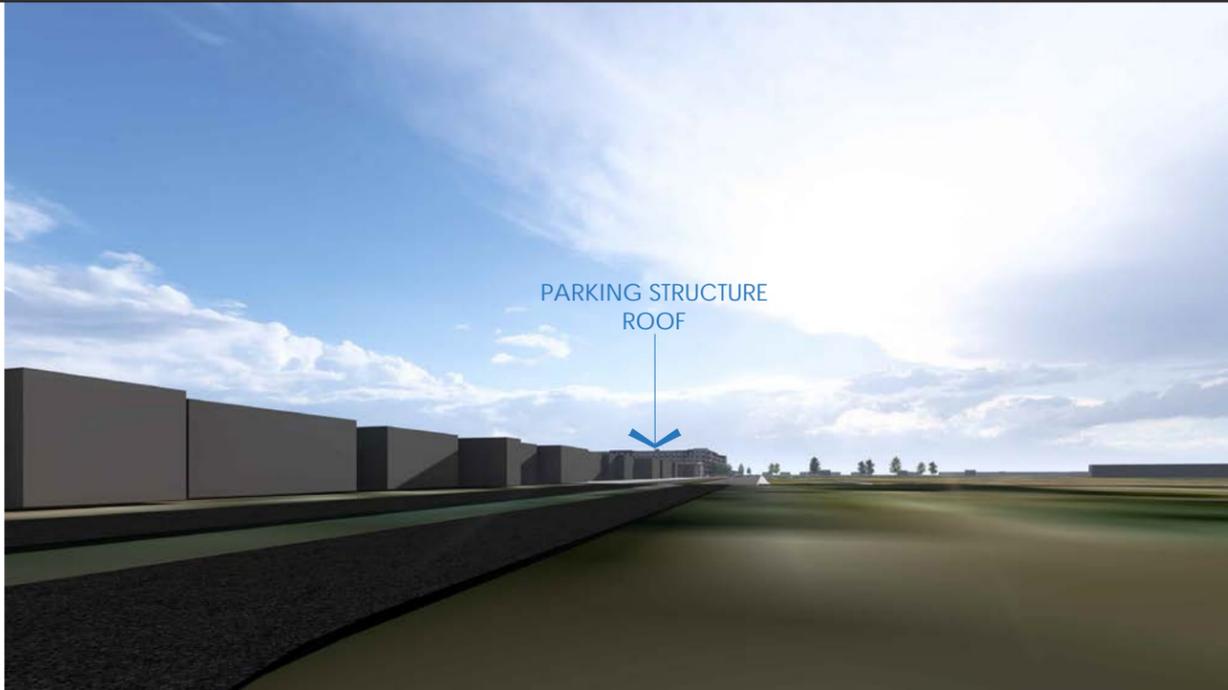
View from Euclid Street near Bellflower Avenue looking south.
